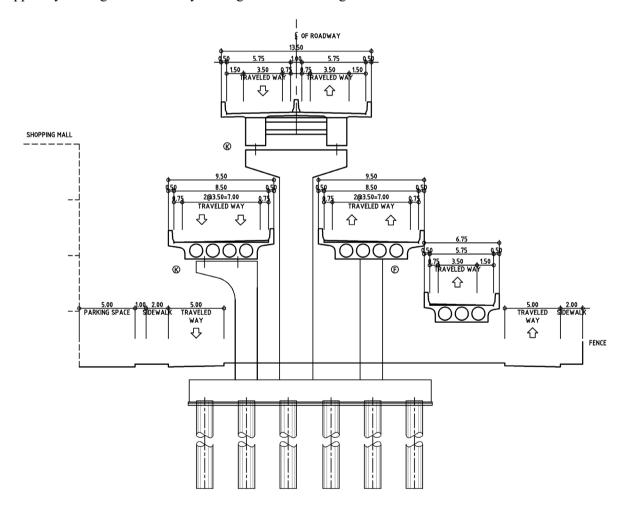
Cross Section of Airport Link Viaduct at upper layer section and overpass of existing road
